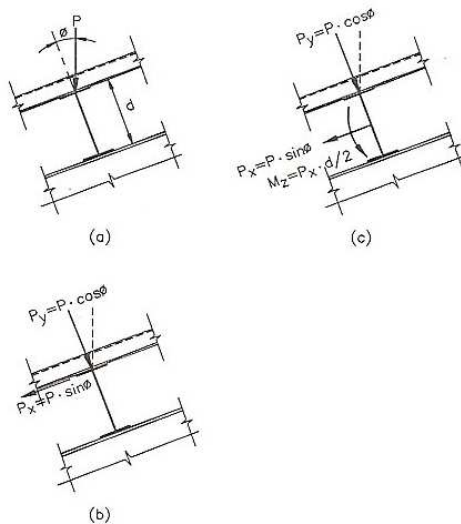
Forces acting on wide-flange purlins (channel purlins are subjected to an additional twisting component due to asymmetry) a) original force, b) force distribution if roofing provides support for top flange, force P_x resisted by deck diaphragm, c) force distribution if roofing provides no support, force P_x resisted by sag rods
